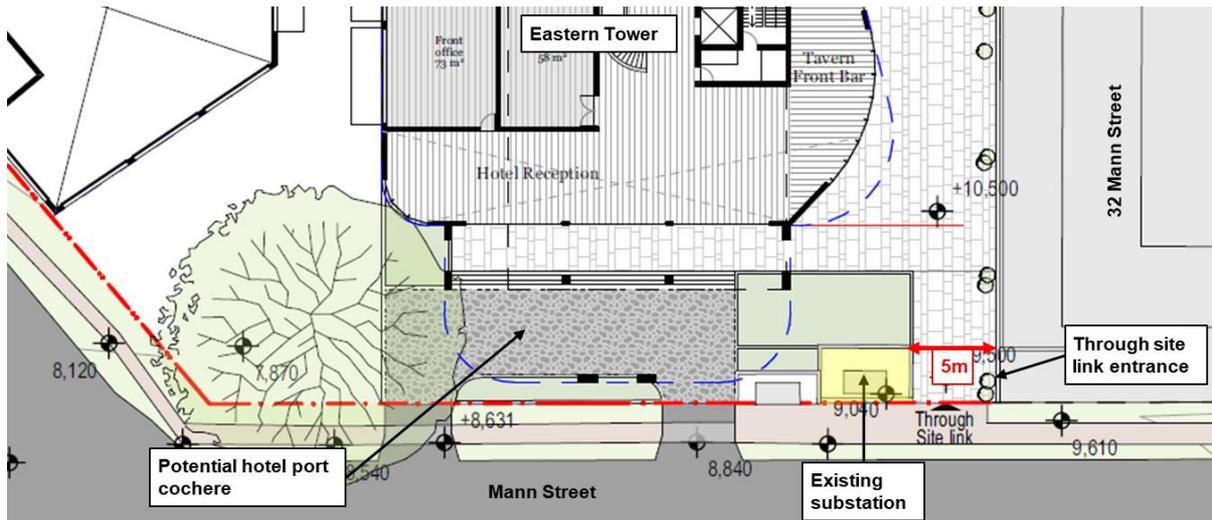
| Indicative ground floor of the Eastern Tower and the northern through site link arm entrance (Base source: Applicant's RtS)
